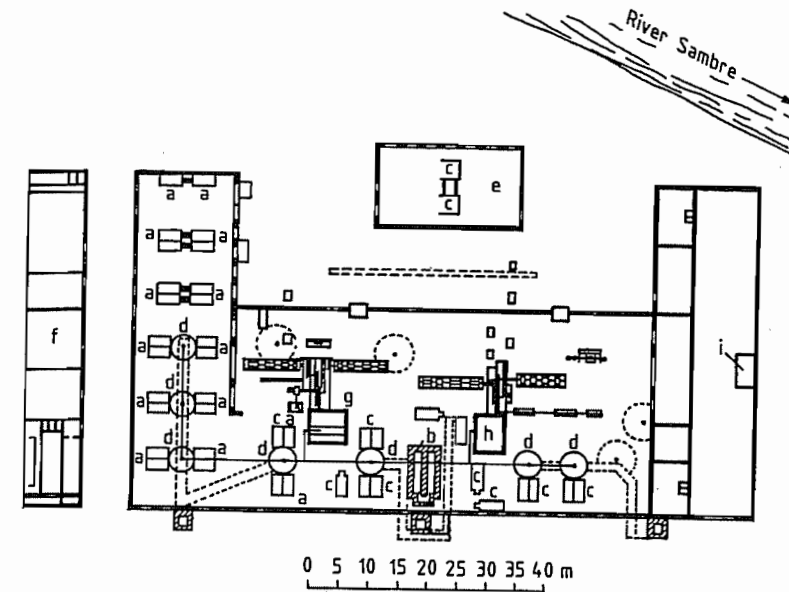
Ground plan of rolling mill at Couillet (1835) [15]: a) Puddling furnace; b) Coal-fired boiler; c) Welding furnaces; d) Waste heat boilers; e) Finishing drop; f) Workshops; g) Machine 1; h) Machine 2; i) Stores.
